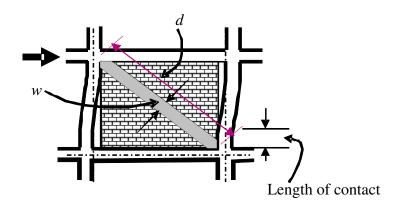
Behaviour of typical panel subjected to lateral load
